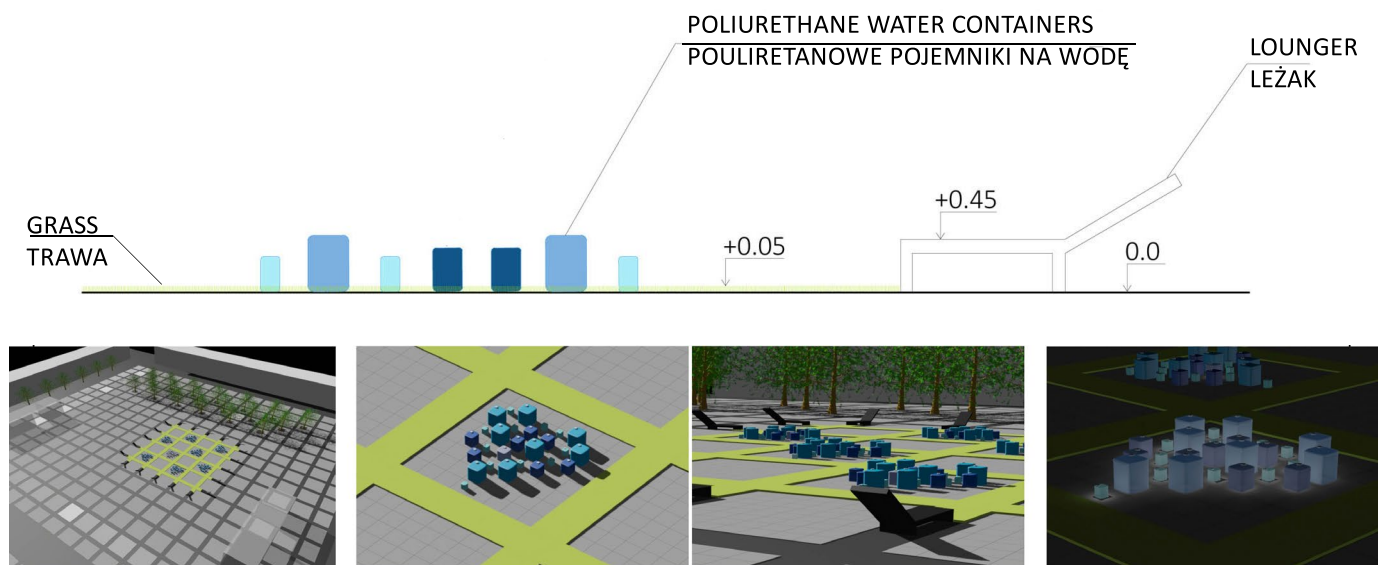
Spatial installation *Every drop counts (Liczy się każda kropla)*. The place of the future fountain was taken by a fountain-like installation made of polyurethane water containers. Stripes of dark granite paving stones which create chessboard pattern were covered with grass. The installation has ecological message “preserve water” (author R. Trojanowska, curators: E. Podhajska, J. Rubaszek, M. Zienowicz)
